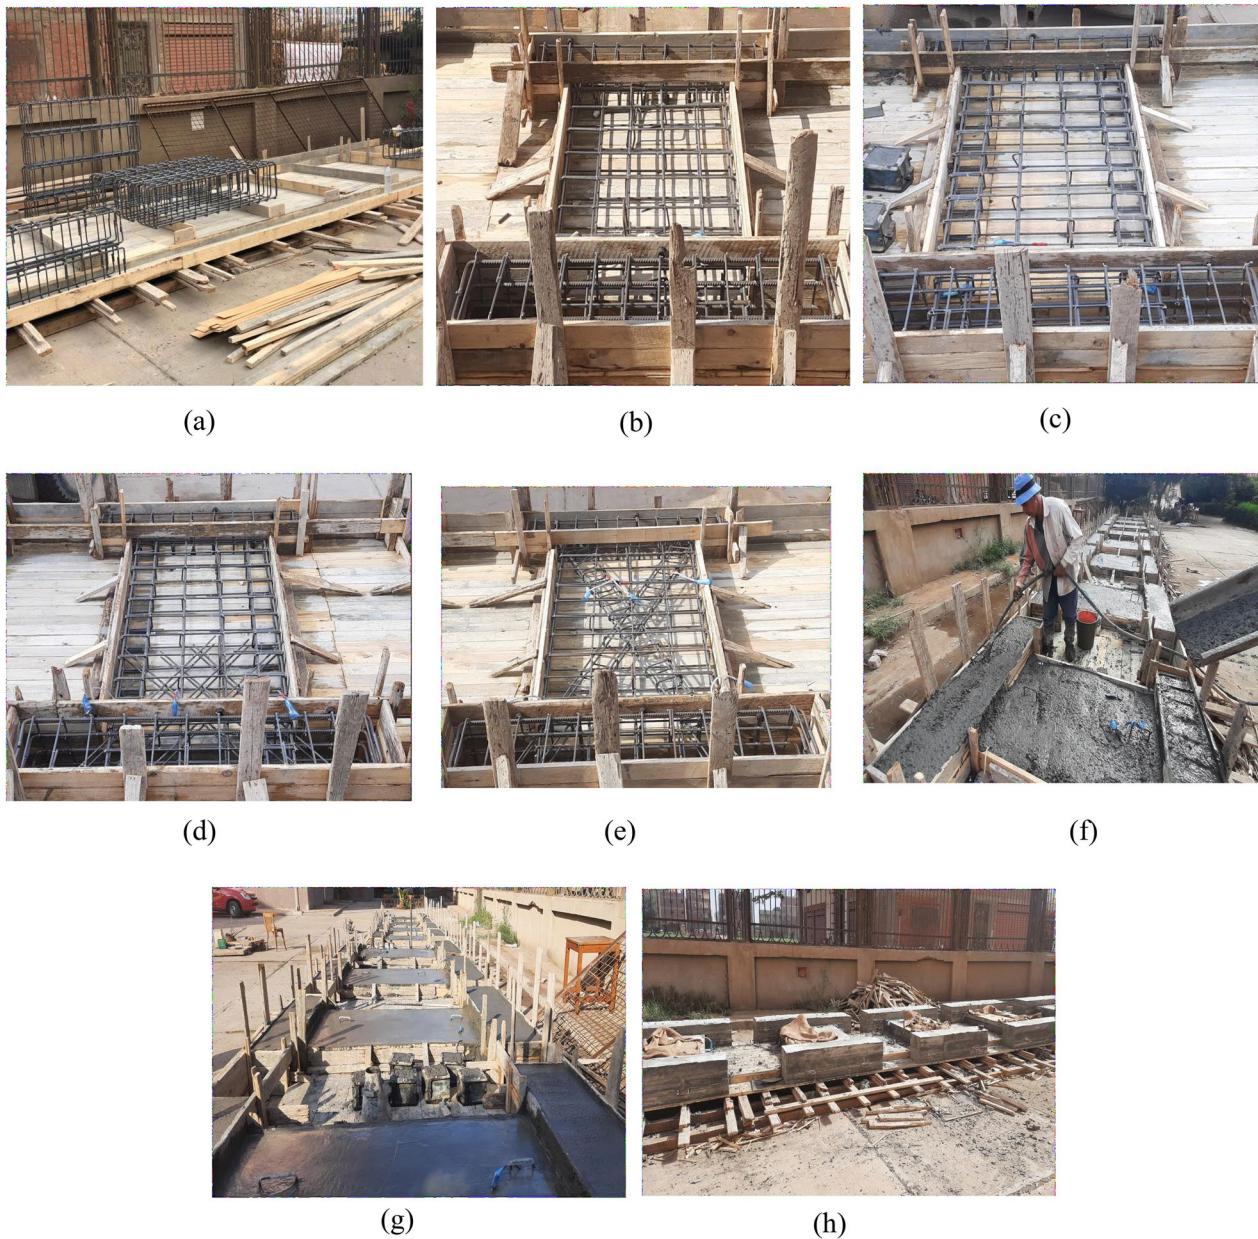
Walls manufacturing process. a Shuttering preparation. b Ordinary wall (G2-RW1-A1.5). c Wall with vertical boundary elements (G2-RW2-A1.5). d Wall with vertical boundary element and mesh (G2-RW3-A1.5). e Wall with inclined embedded column (G2-RW4-A1.5). f Concrete casting. g Preparing of concrete surface. h Shuttering removal after curing
